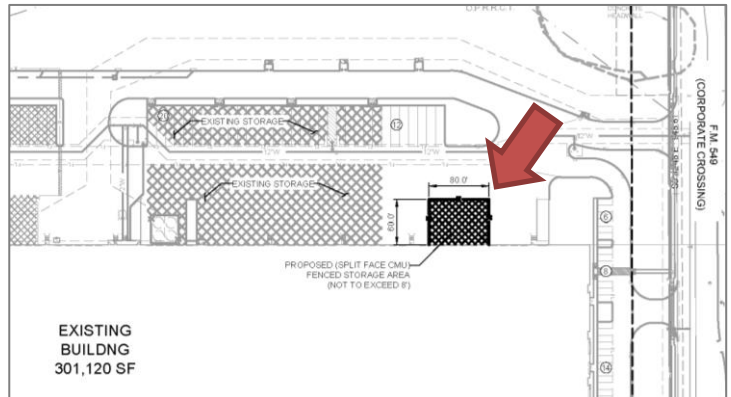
SITE PLAN SHOWING THE LOCATION OF THE PROPOSED OUTSIDE STORAGE AREA.
